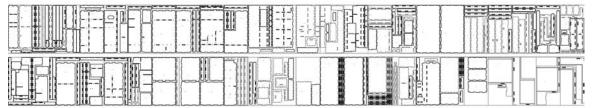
C3, Progressive accumulation of panitures: wall panitures with integrated staircase/storage; lower floor panitures; integrated ring beam and mezzanine; mezzanine wall panitures; parapet with roof structure.
